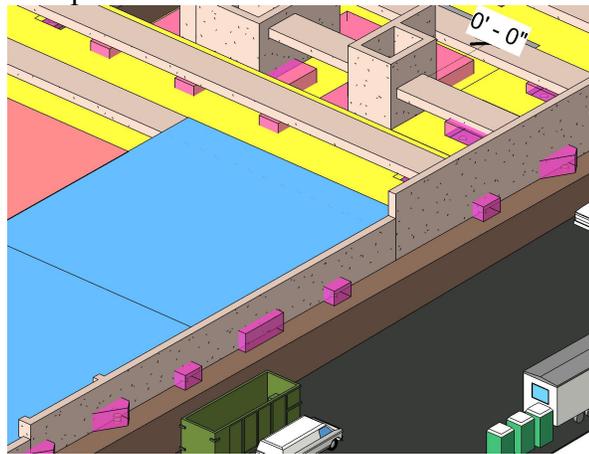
Object representing band beams, sub-grade, slab on grade and walls
